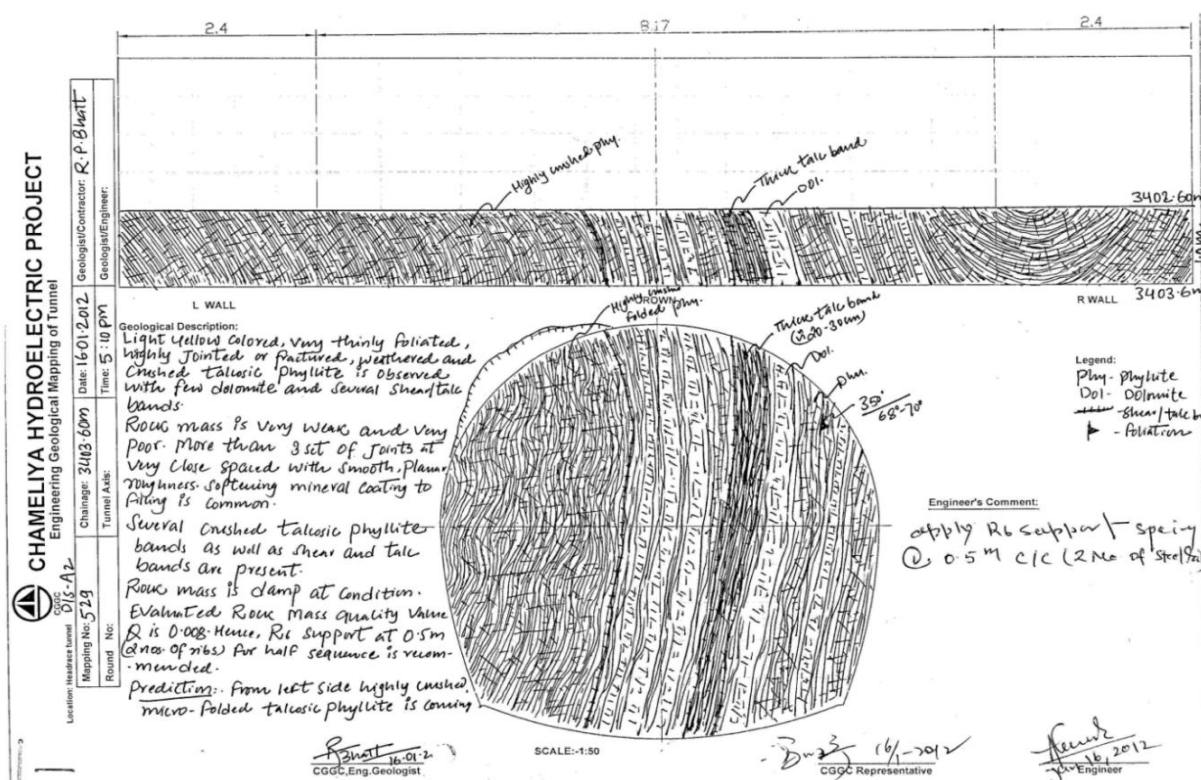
A typical tunnel log of CHEP headrace tunnel at chainage 3+404
